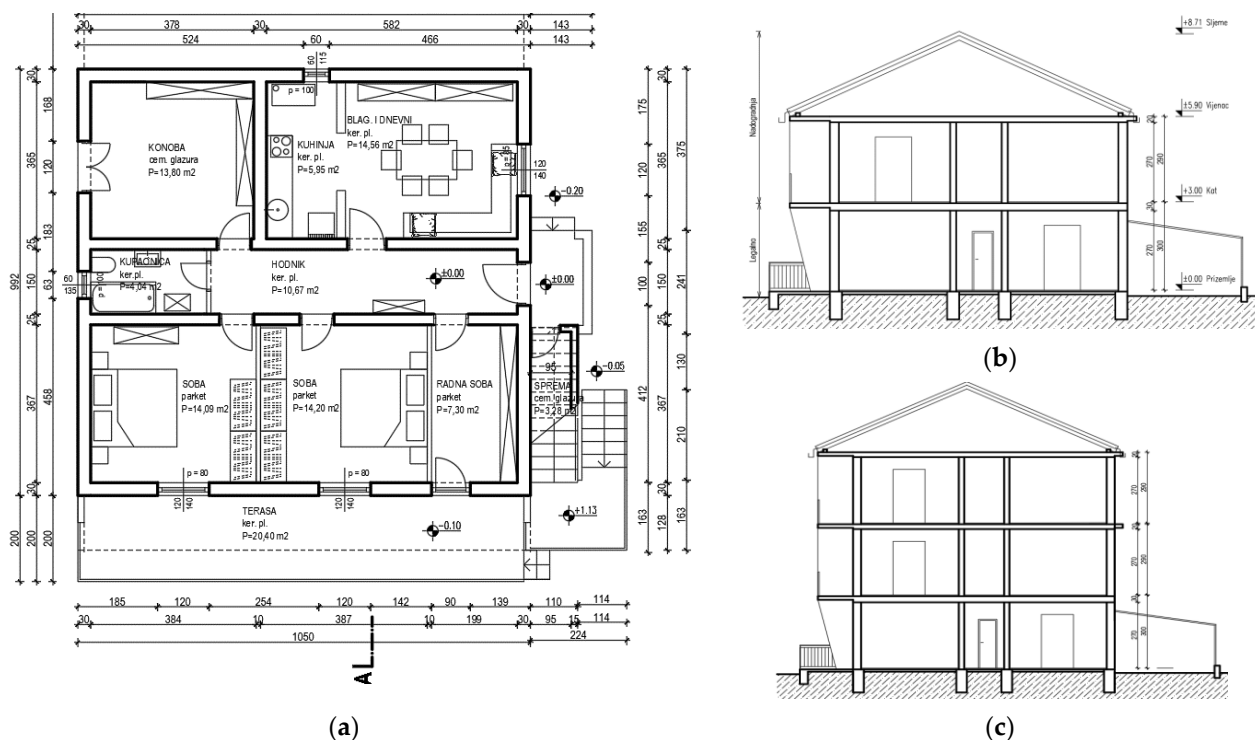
Typical configurations outside of the historical center: (a) plan; (b) section view P + 1; (c) section view P + 2.
